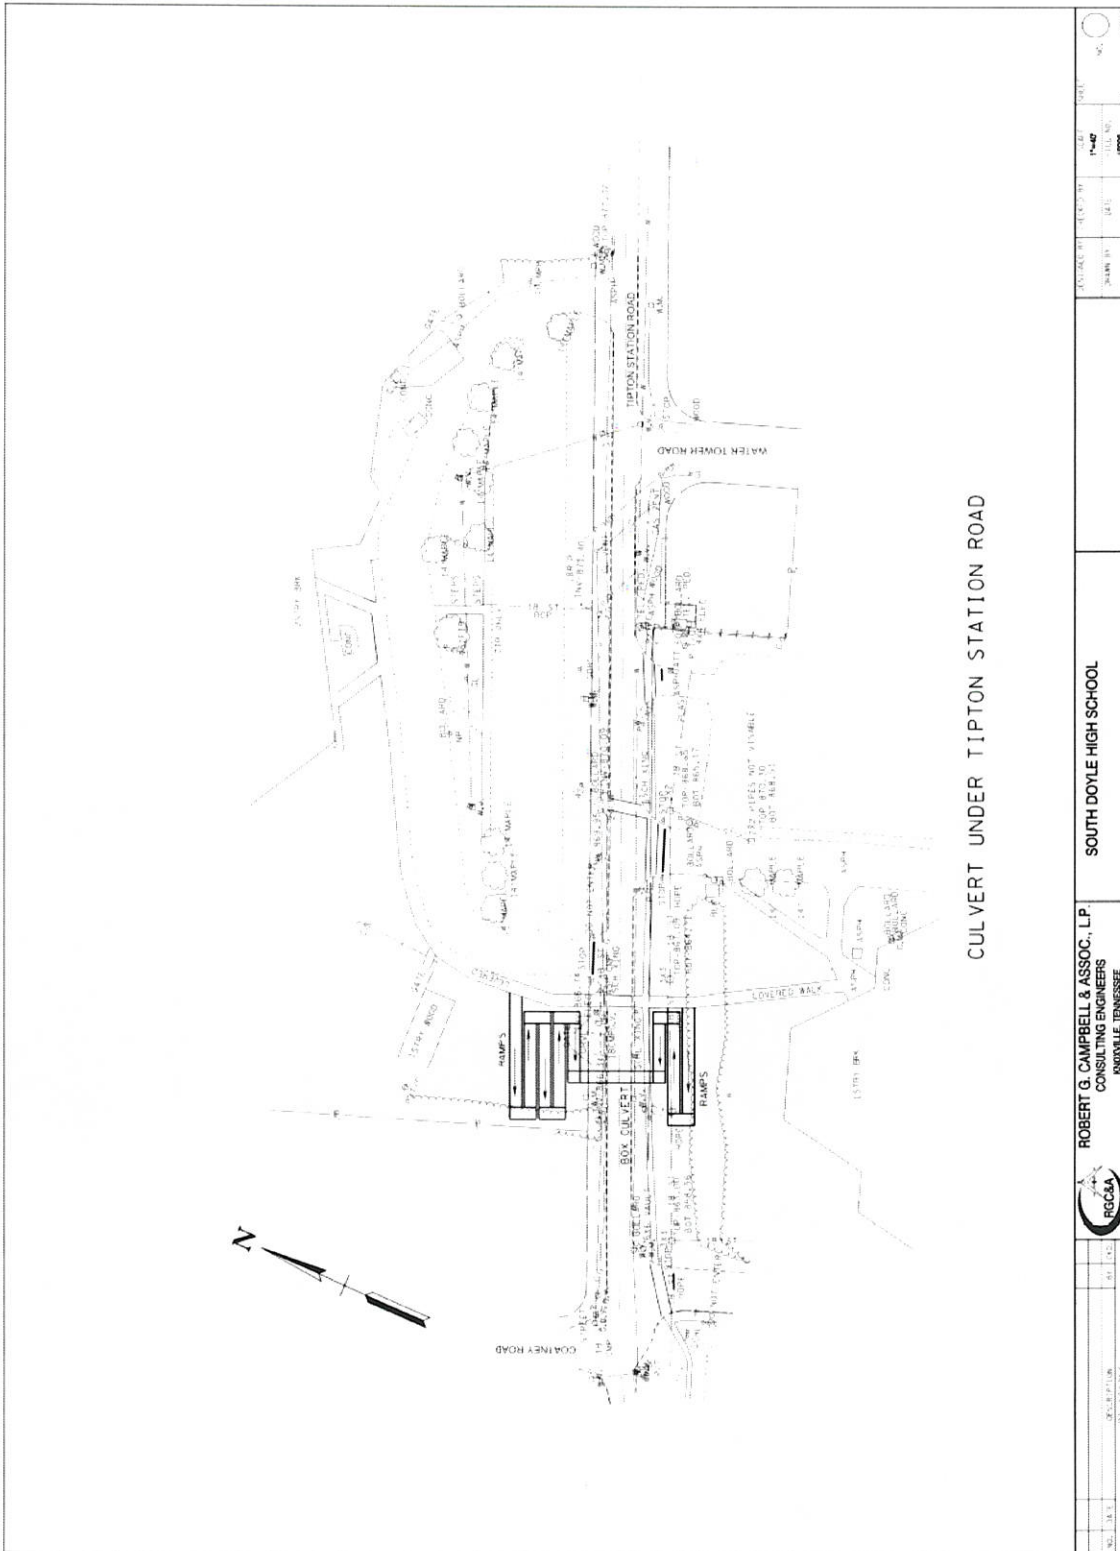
UNDERGROUND TUNNEL (LAYOUT)
